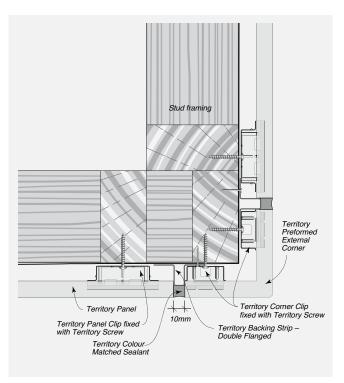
External Corner Detail – with Aluminium External Corner
